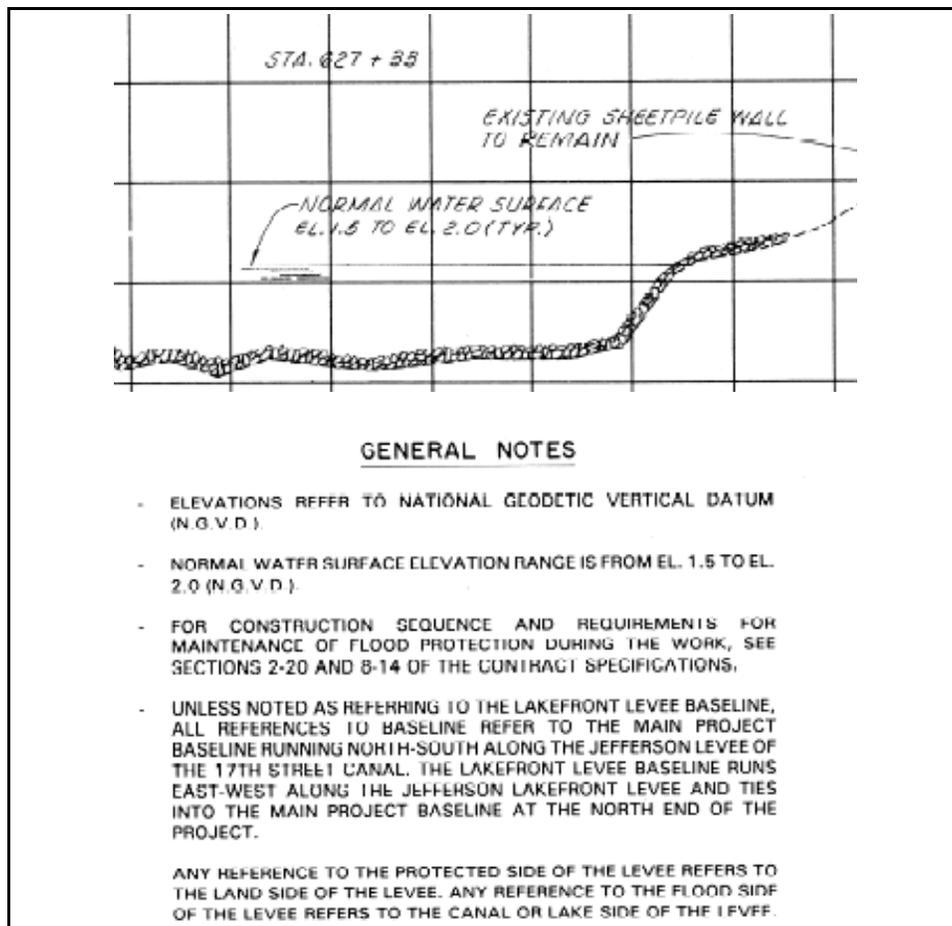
Typical section and General Note depicting “normal water surface” in 17th Street Canal at 1.5 to 2.0 ft elevation. (Contract 92-1 Board of Levee Commissioners of East Jefferson Levee District -17th Street Canal West Side Levee Improvements).
